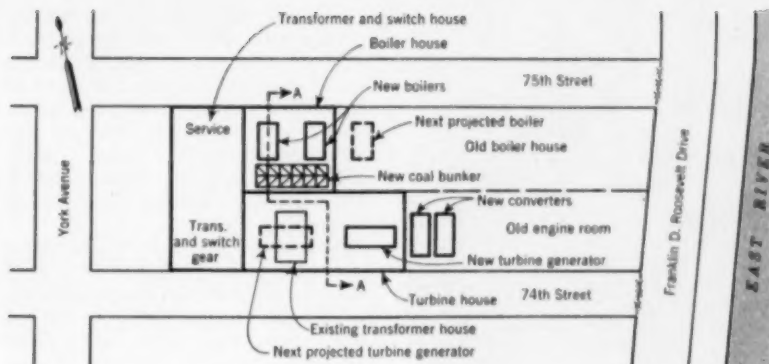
Plan indicates how problem of locating new facilities on crowded site was solved so as to keep East 74th Street Plant in continuous operation. Left side of section A-A is through new Boiler House, right side through new Turbine House.
